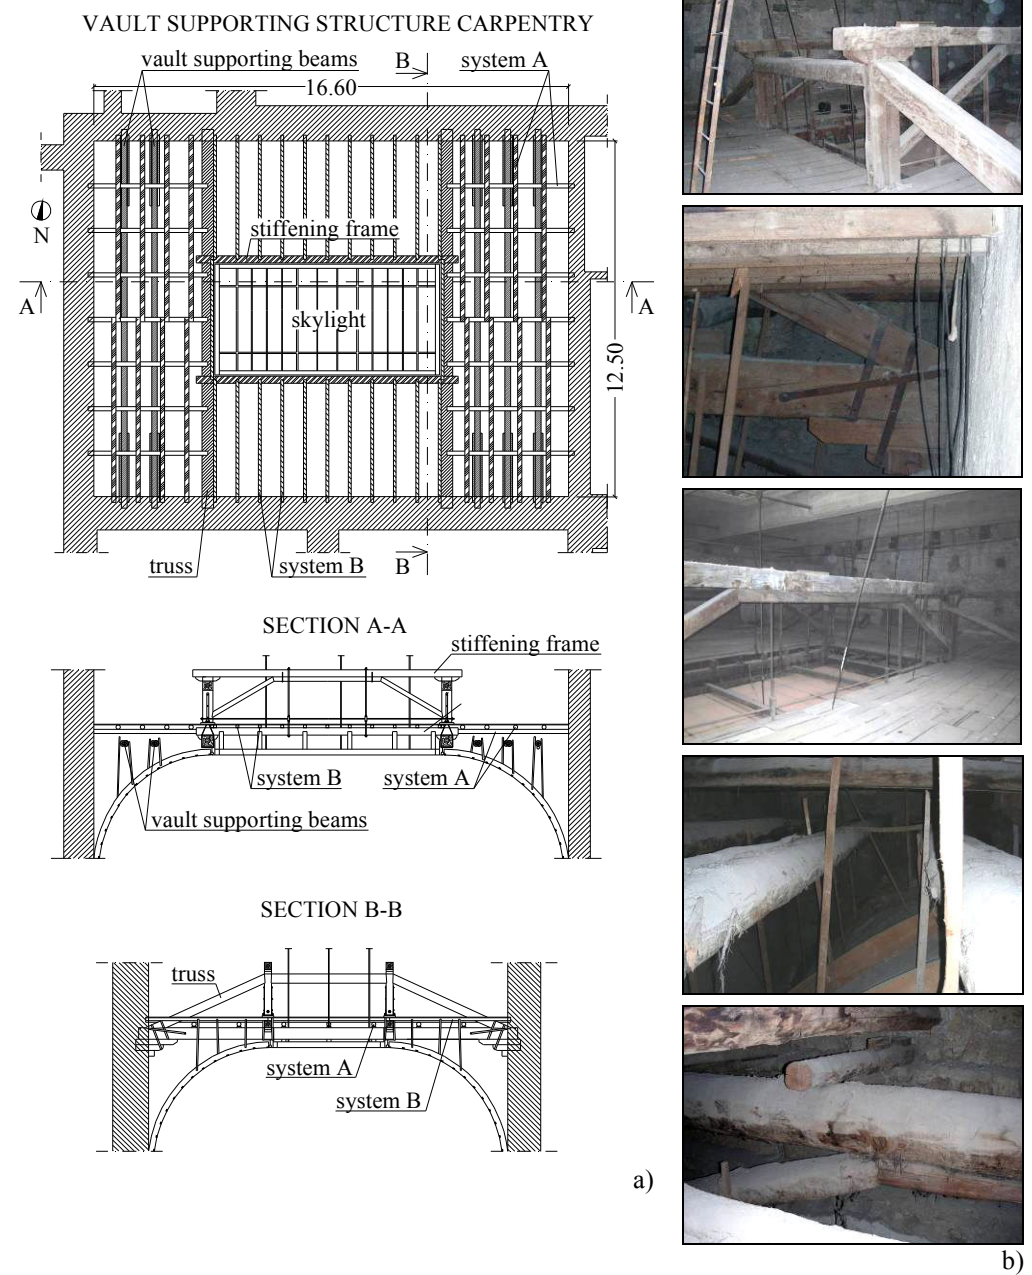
Guard Room (XXIX) – Geometrical survey – Vault supporting structure:
